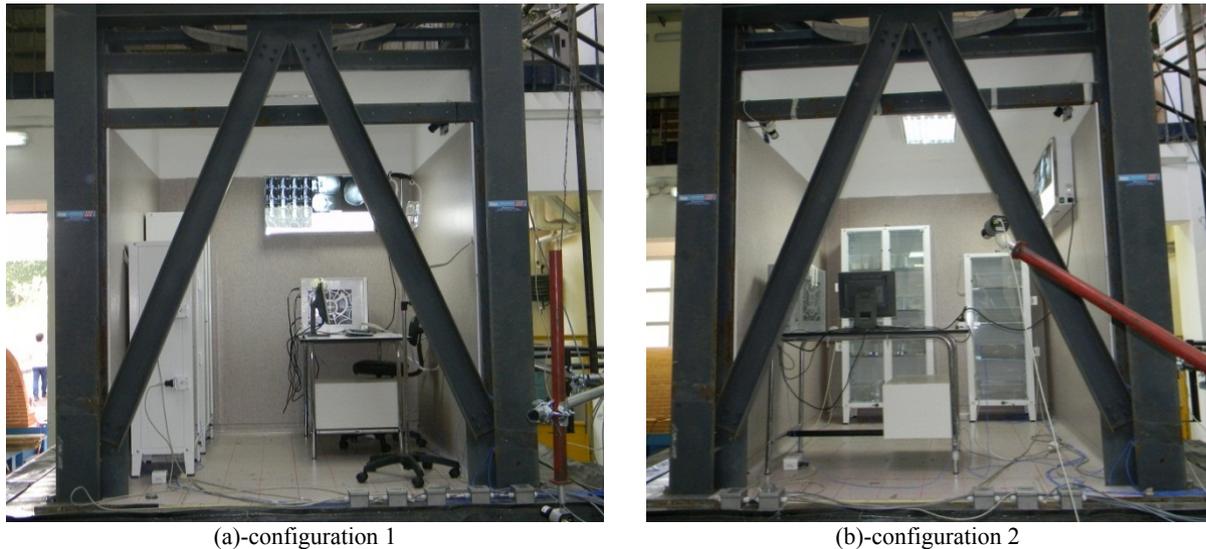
Photo of the test setup: (a) configuration 1, adopted in test groups 1000, 2000 and 3000 and (b) configuration 2, adopted in test groups 4000, 5000 and 6000.
